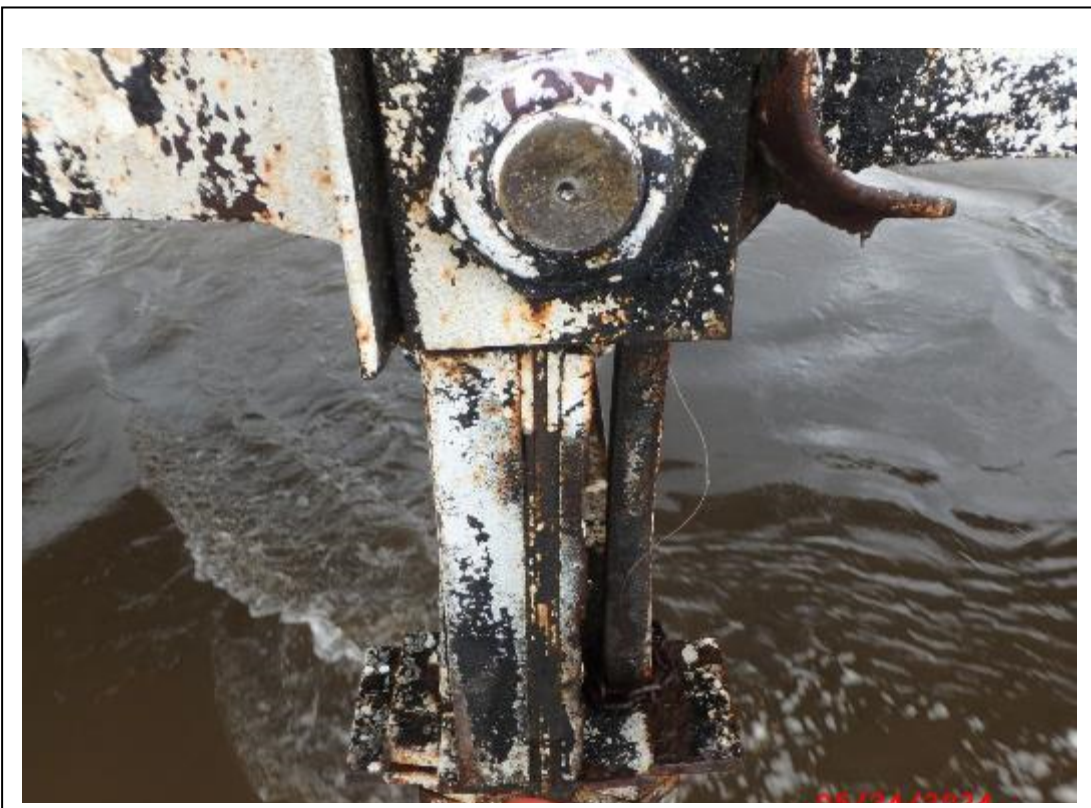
L3W – FLOORBEAM, SOUTHWEST FLANGE
